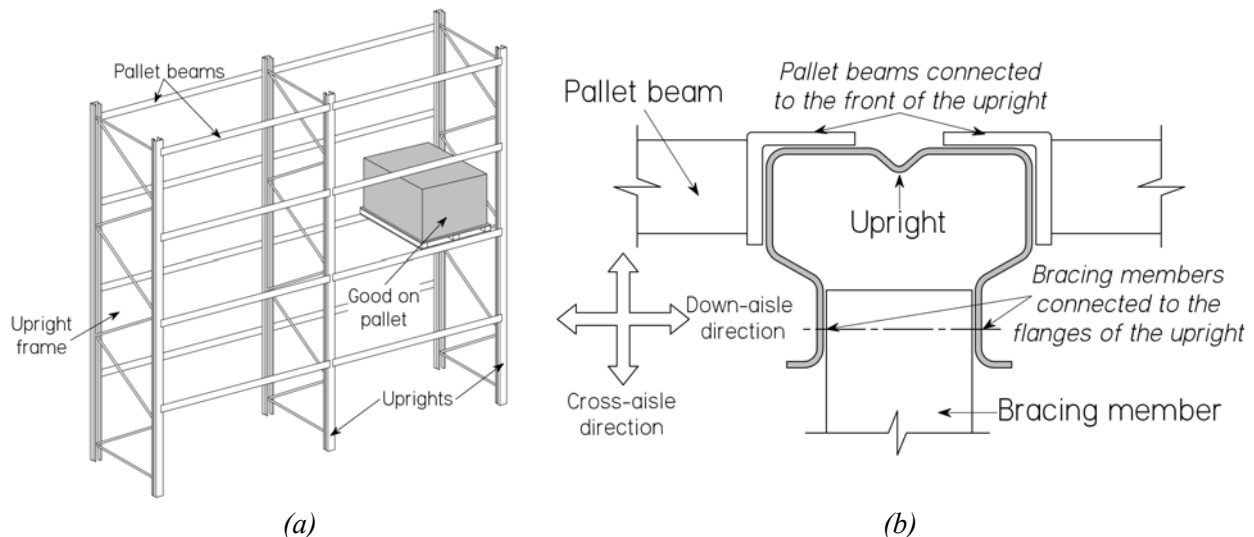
(a) general lay-out of steel storage rack upright and (b) upright cross-section showing bracing and pallet beam member connections
